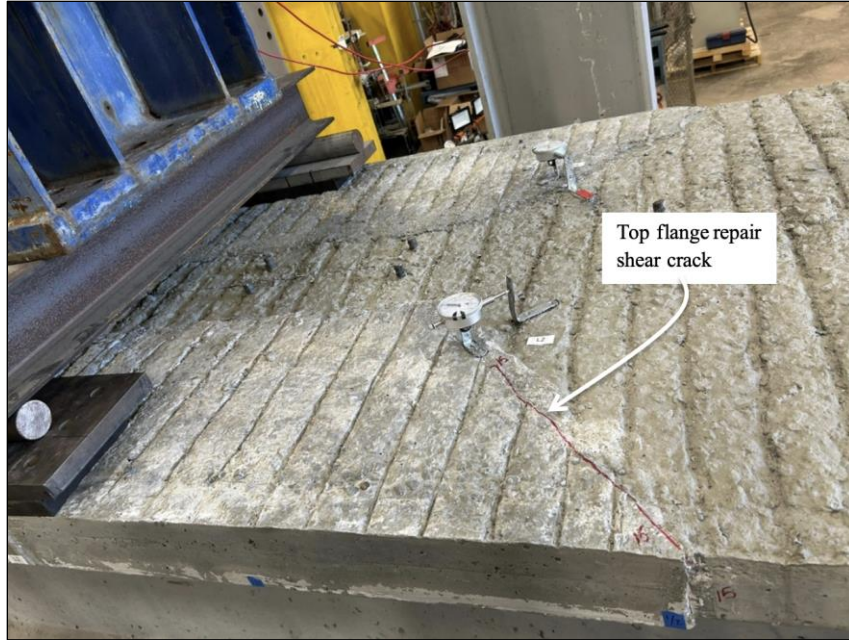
Photo. Test 1.4.F (repair 1.3RTF, 1.3LTF) top flange shear cracks at 15 kip (left face of girder pictured).
